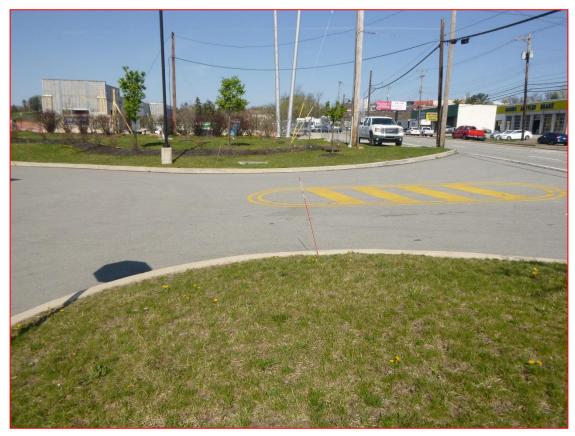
Route 30 entrance to Getgo – Facing Northwest (04.12.2023)
